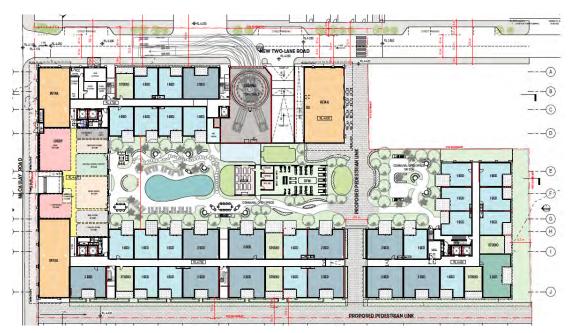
Ground Level Plan extract of Ministerial Planning Application PA2201709. From Drawing AD-DA100
